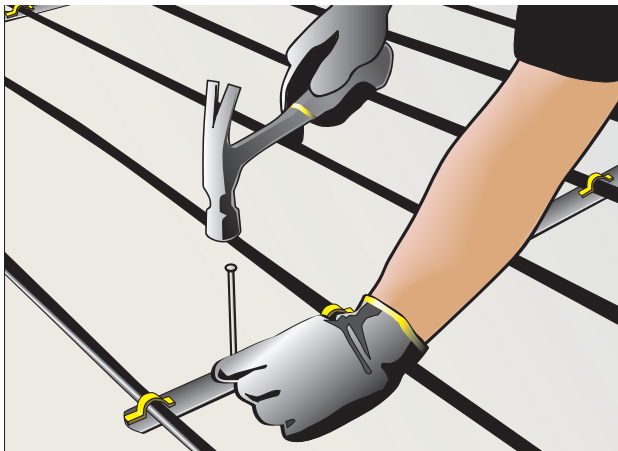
Fastening to a compacted sub-base: Use at least two 6" landscaping nails to anchor each spacer strip.
